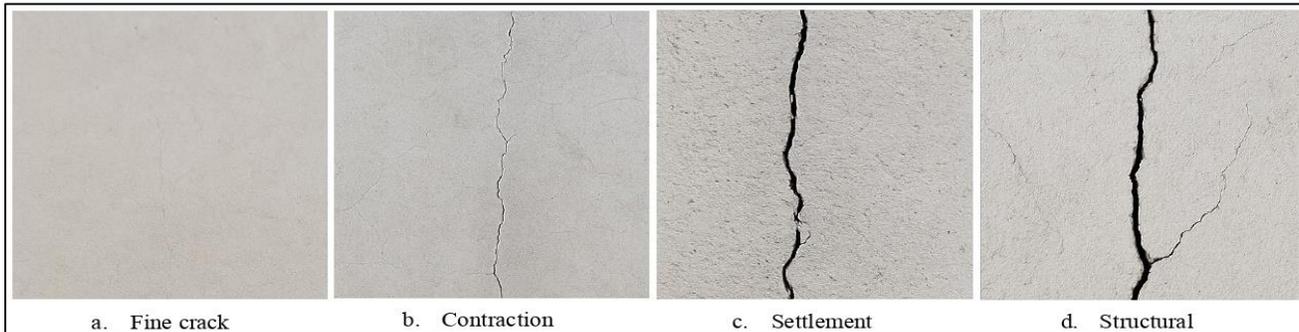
Common types of cracks in concrete: (a) fine shrinkage cracks, (b) plastic shrinkage, (c) plastic settlement, and (d) structural cracks
